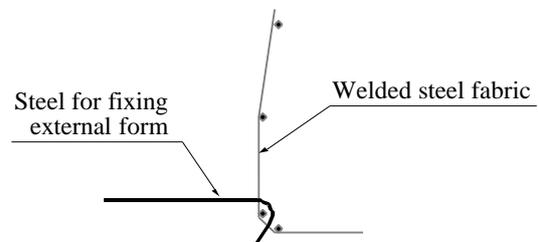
Example of the method to arrange steel for fixing external form to welded steel fabric
